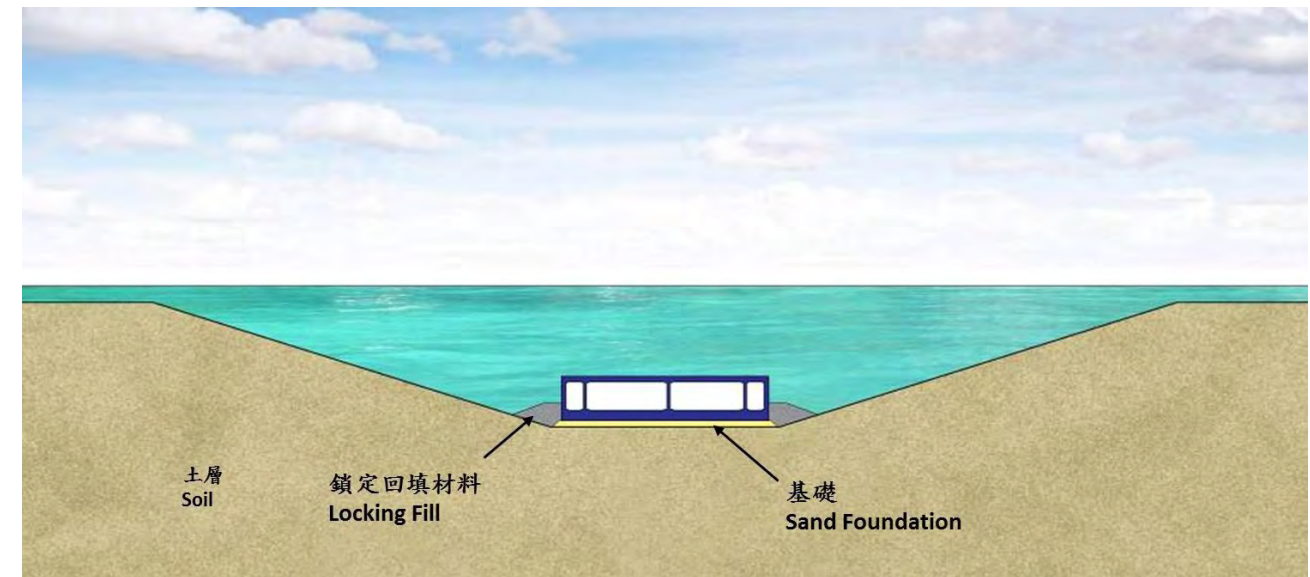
(c) Step 3 – Sink and Merge Pre-Cast Tunnel Units and Place Locking Fill
